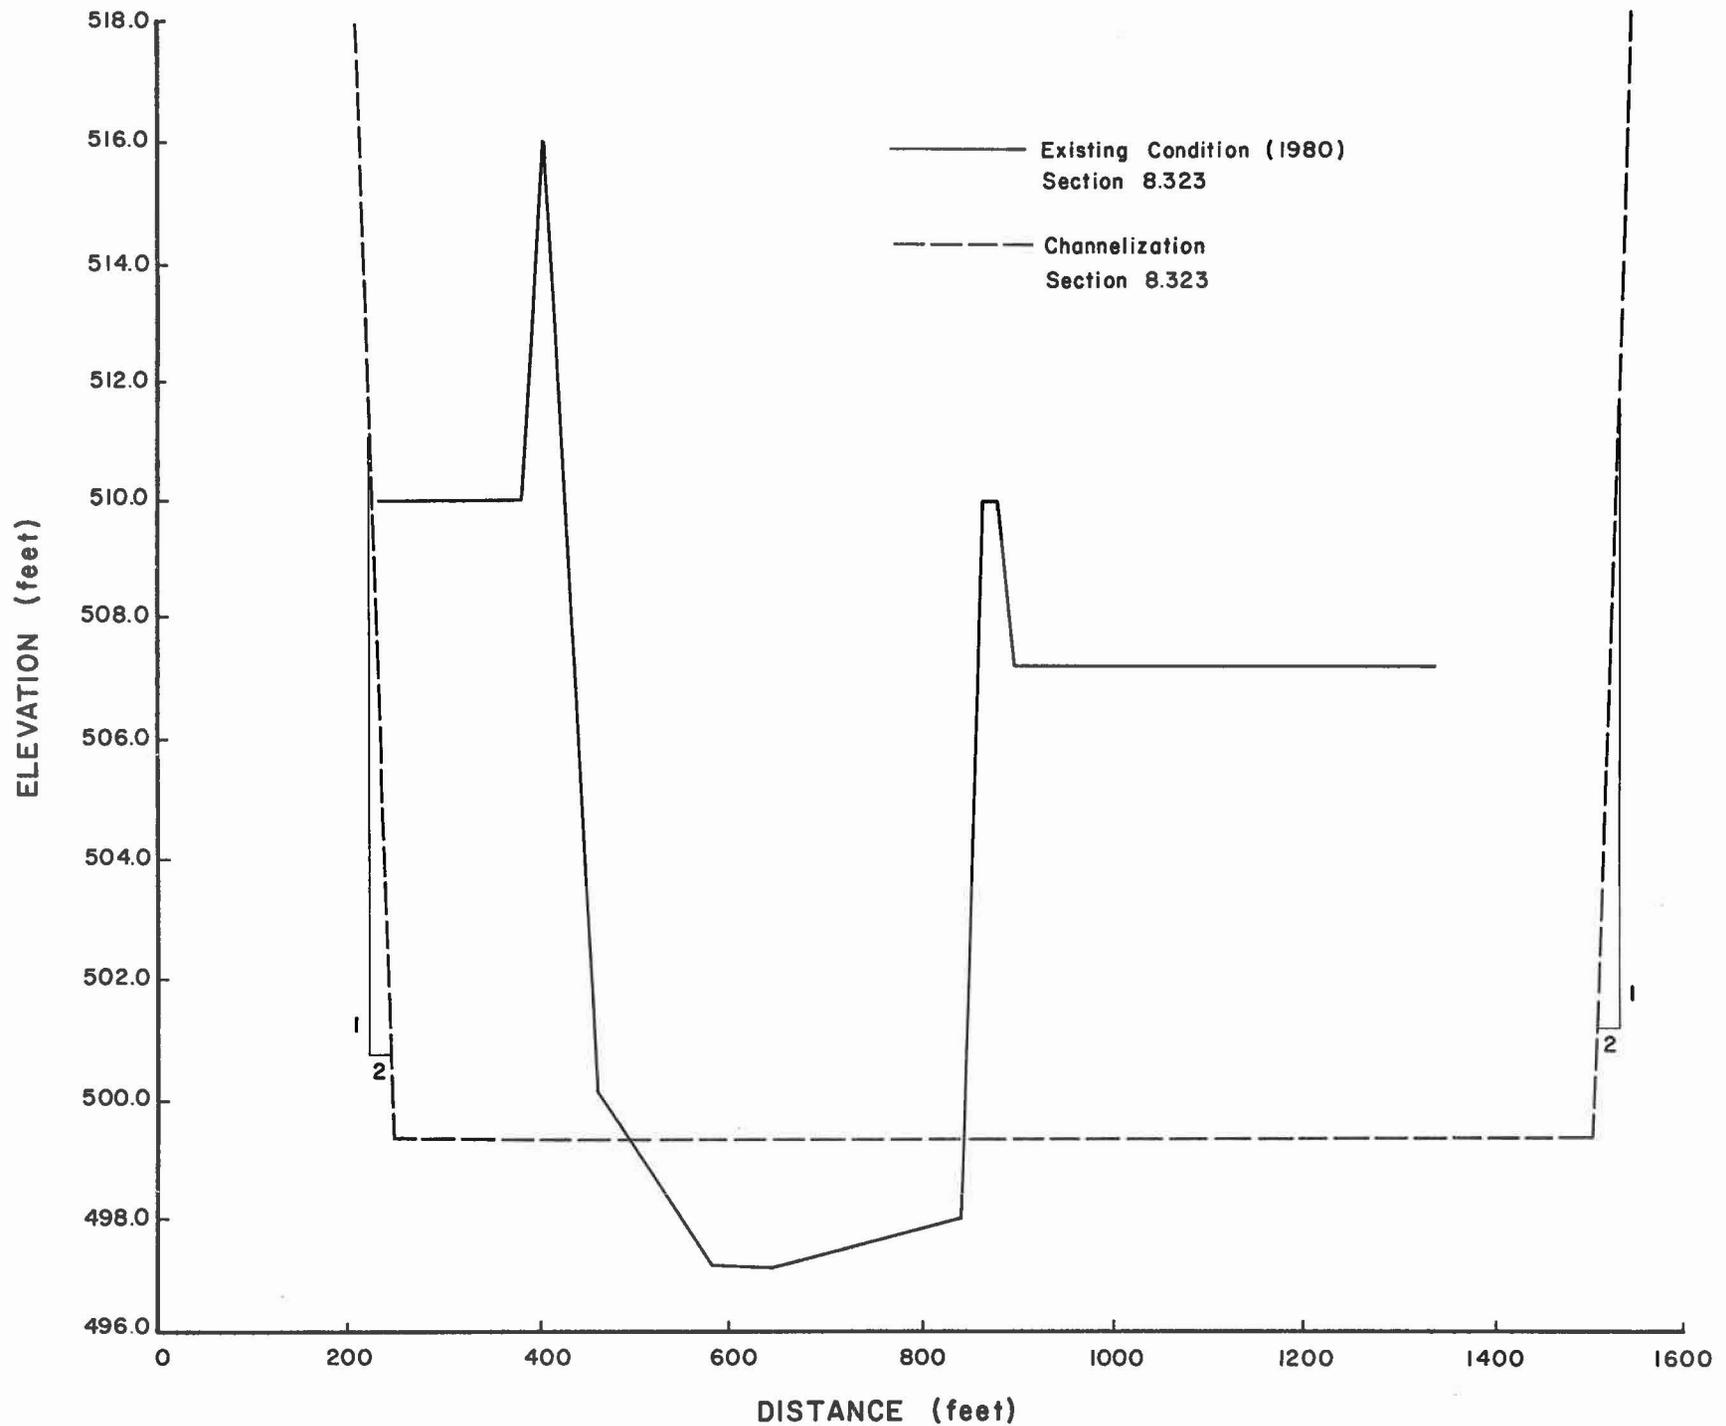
Sketch of SLA channelized cross section in comparison with existing cross section between Iron Small Run Bridge and Rose Iron Bridge at Little Falls.
